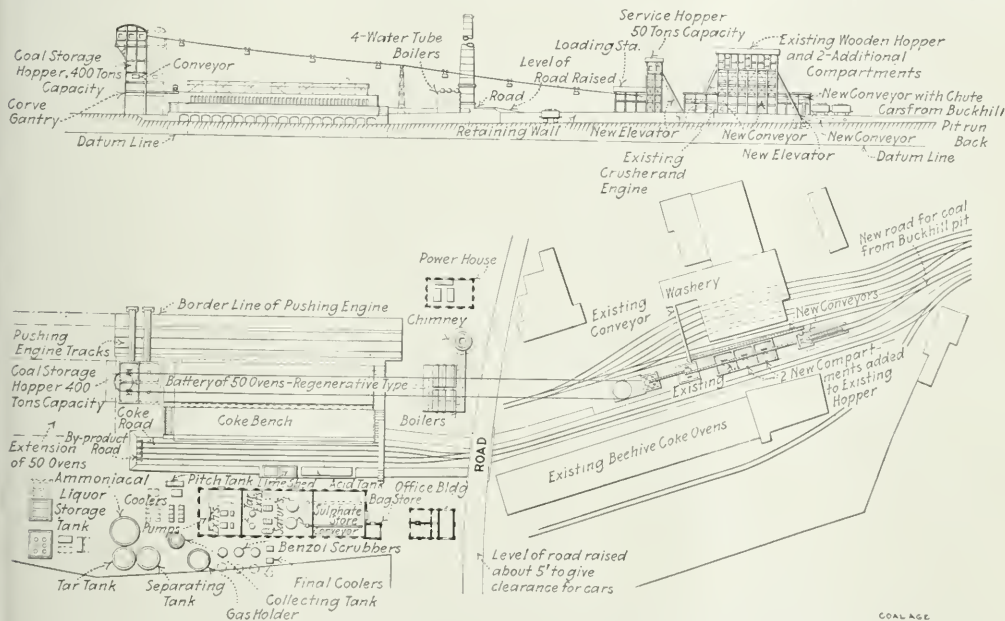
GENERAL PLAN AND ELEVATION OF BYPRODUCT PLANT AT THE CLIFTON COLLIERY
